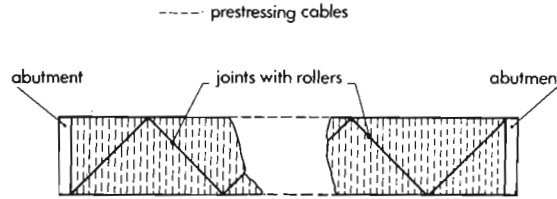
Diagram of prestressed concrete runway at Orly, 1947.
